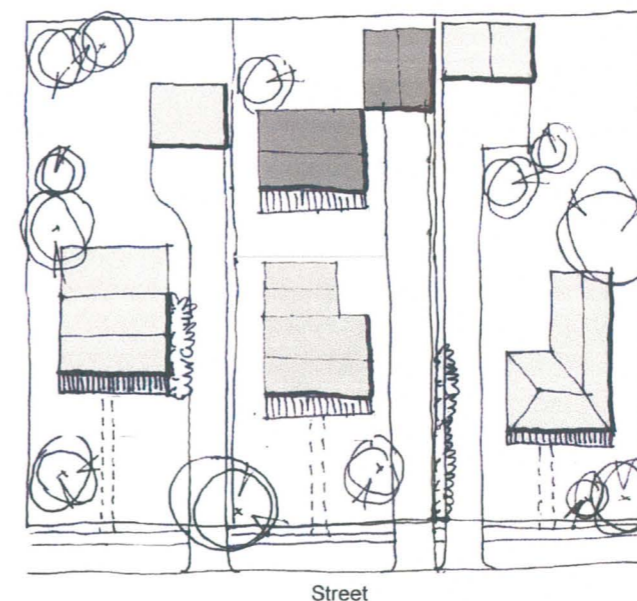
Good example of a new infill dwelling to the rear, retaining the setting of the existing building.
